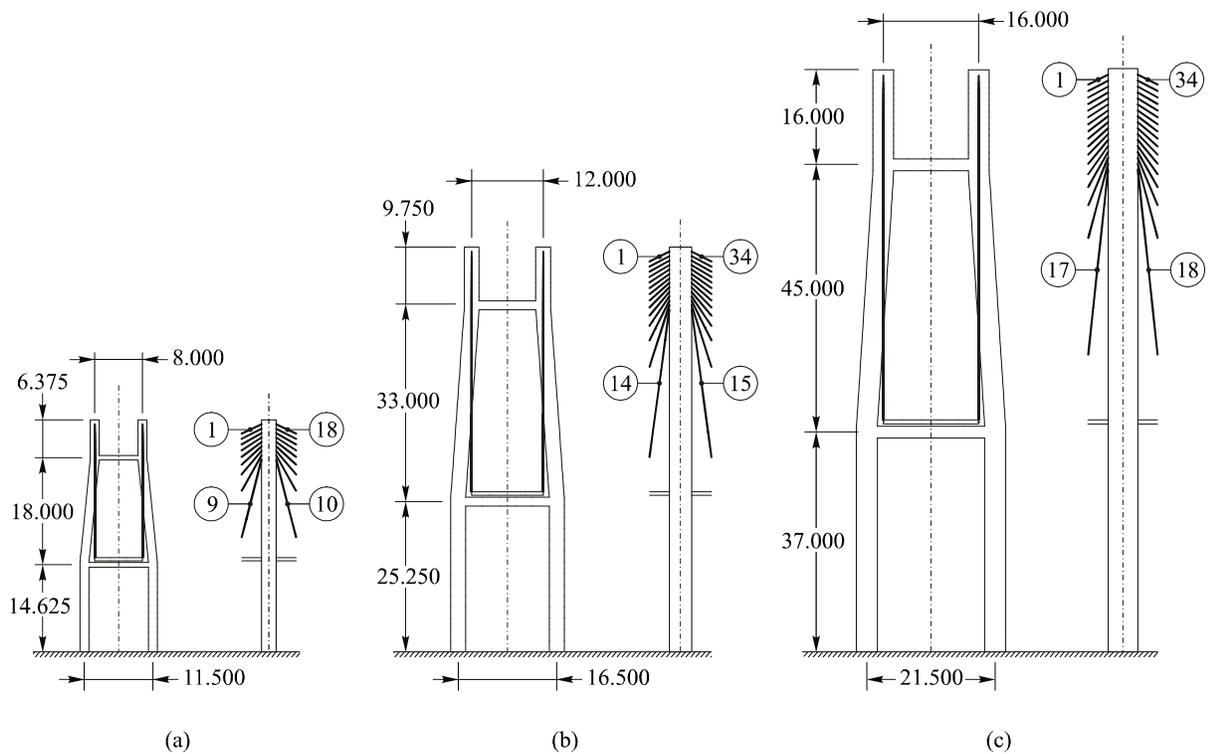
Elevations of the pylons and numbering of the stay cables for the three bridge models studied: (a) Bridge 1, (b) Bridge 2, and (c) Bridge 3 (dimensions in meters).
